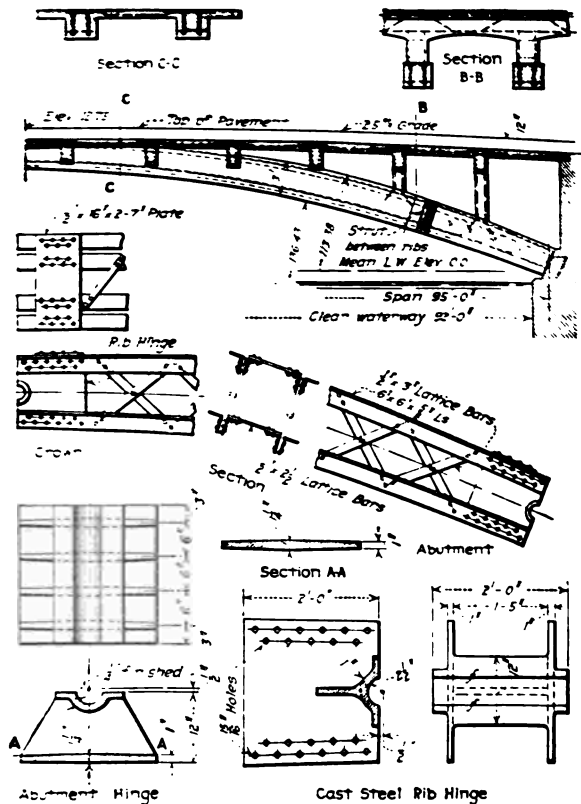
Pratt Street bridge over Jones' Falls, Baltimore, Md.
